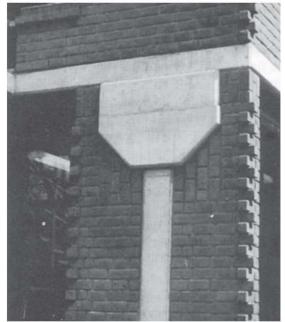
Concrete column and floor edge forming a thermal bridge
